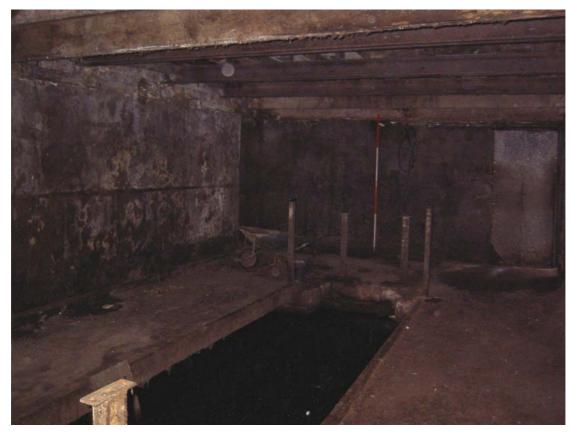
General view of the south end of Room 4 of the dairy showing the large pit
